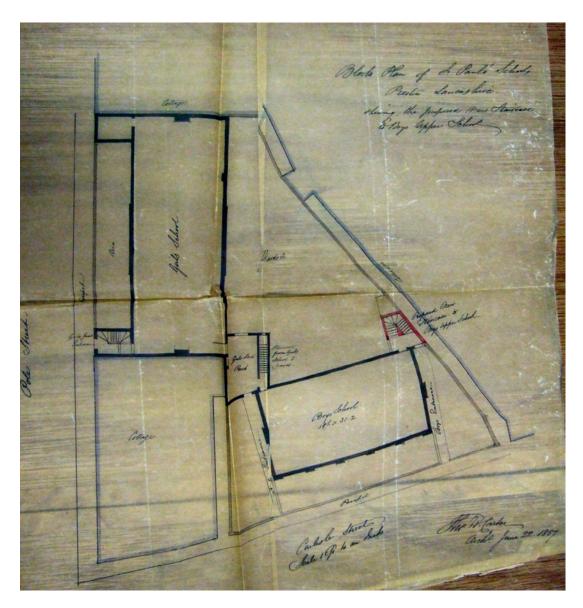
Plan showing school (Site 20) with alterations, 1857. The infants' school is now marked as a girls' school (PRO SP 246)
